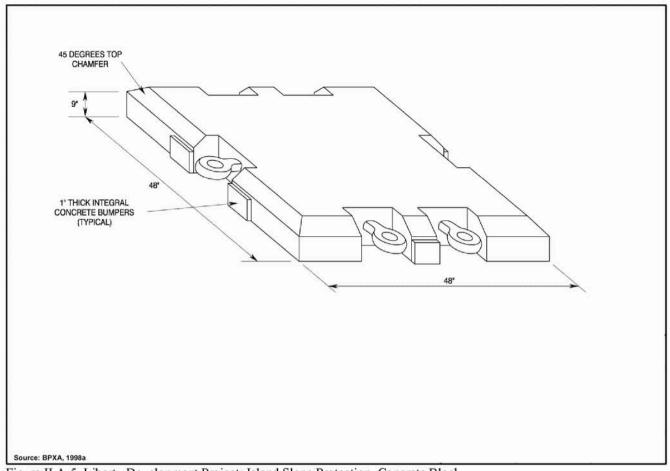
Liberty Development Project: Island Slope Protection, Concrete Block
